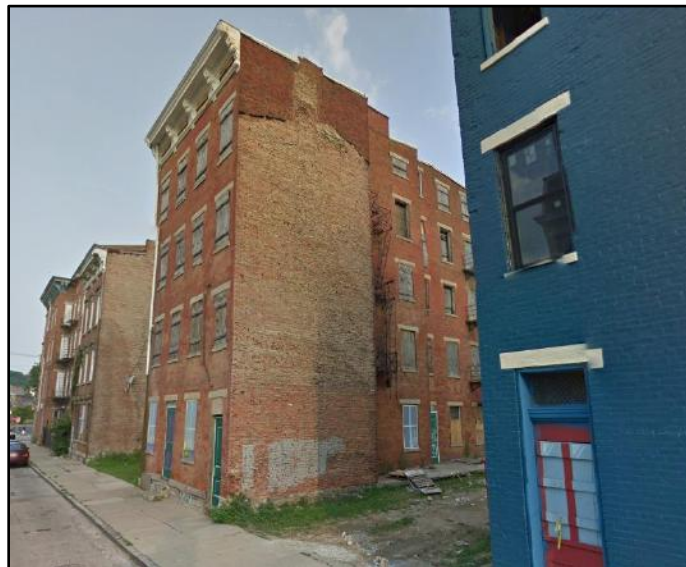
215 Wade Street. Picture provided by Google Street Views
